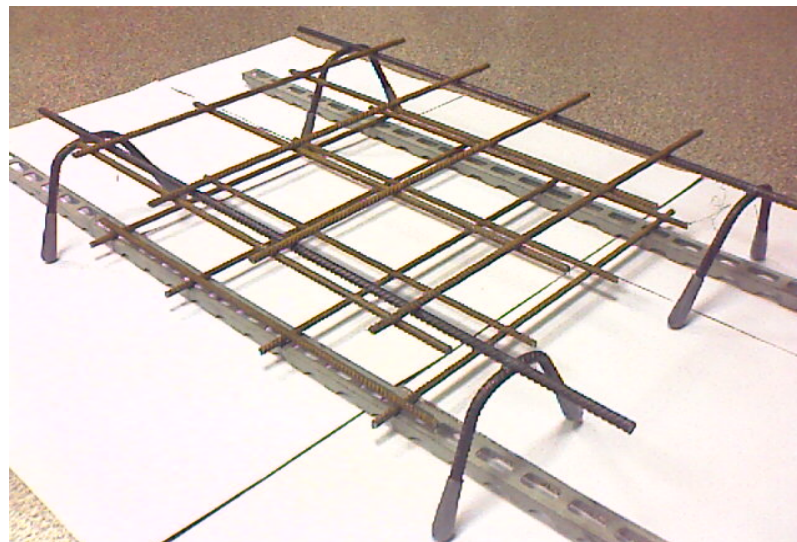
The scheme of reinforcement slabs with meshes (5)
